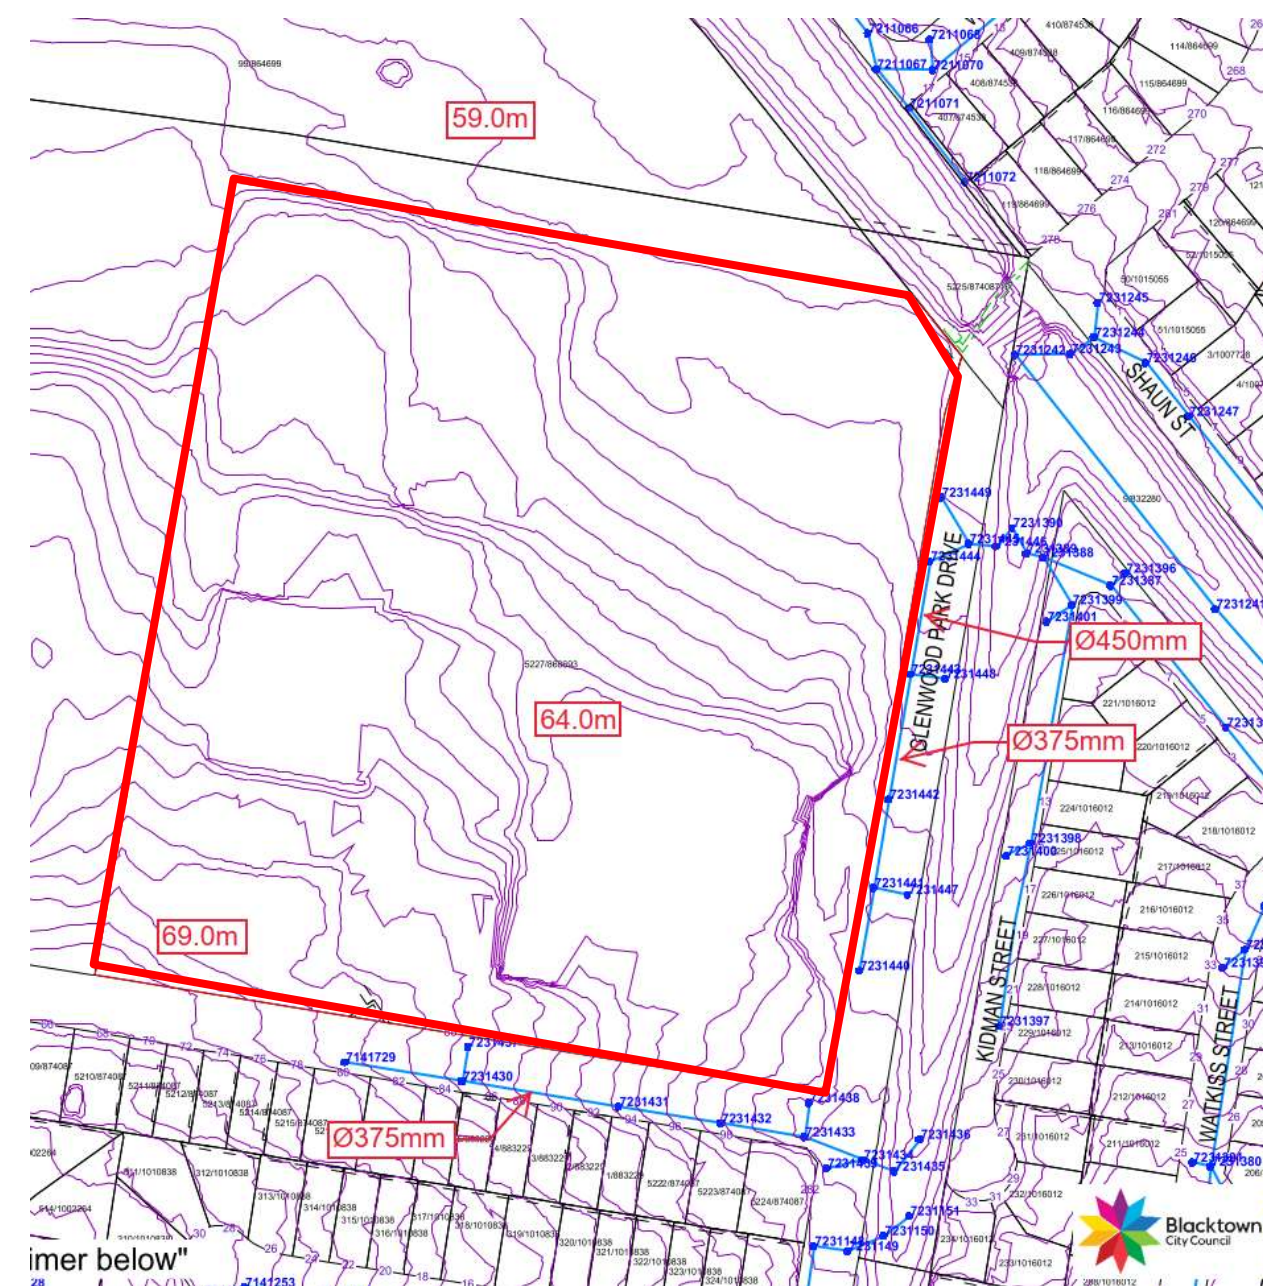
Existing Stormwater Infrastructure (Source: BCC Correspondence as provided in Appendix B)
